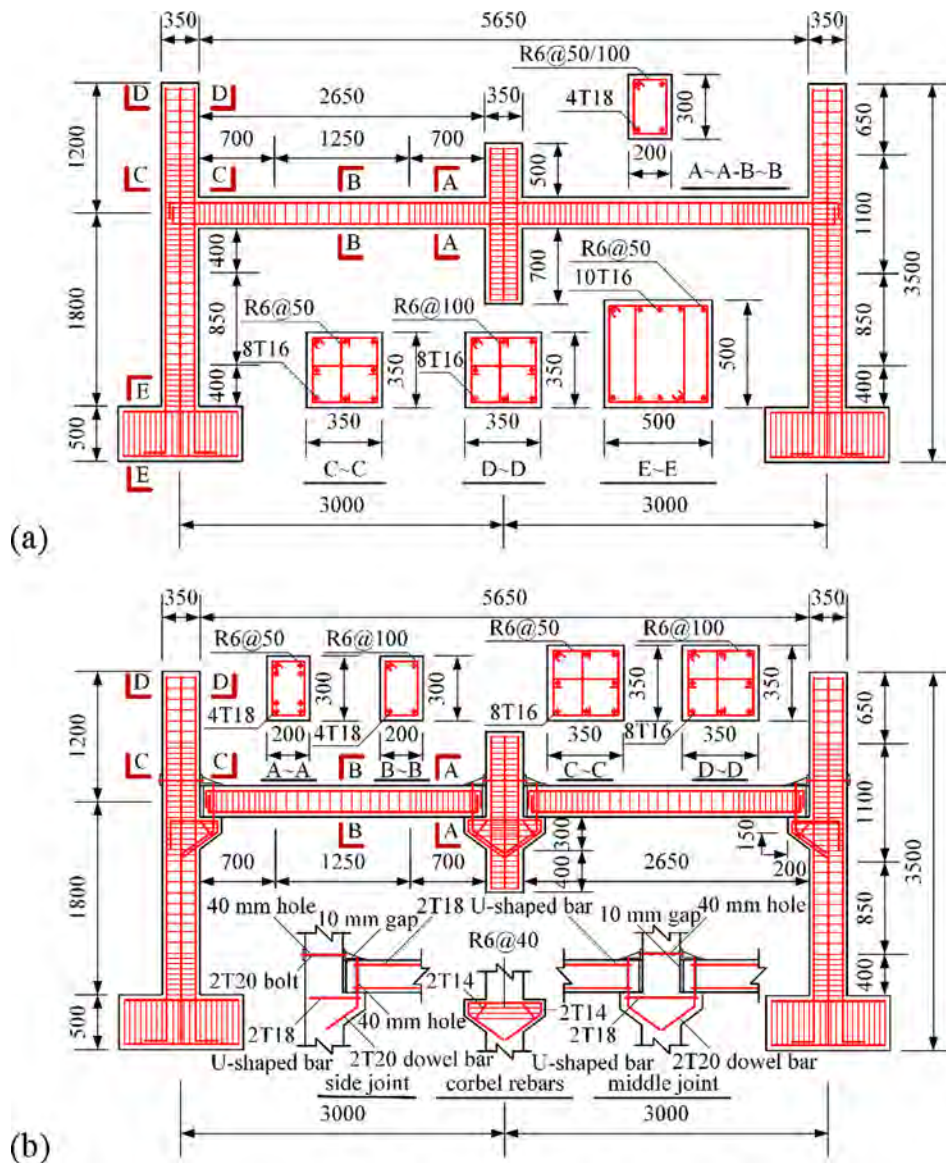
Cross-sectional details of test specimens: (a) RC specimen; (b) PC specimen (unit: mm).
